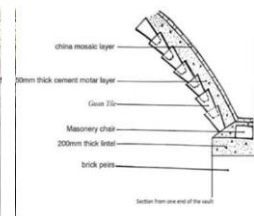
Laying of Guna Tiles Fig 18 Section showing
